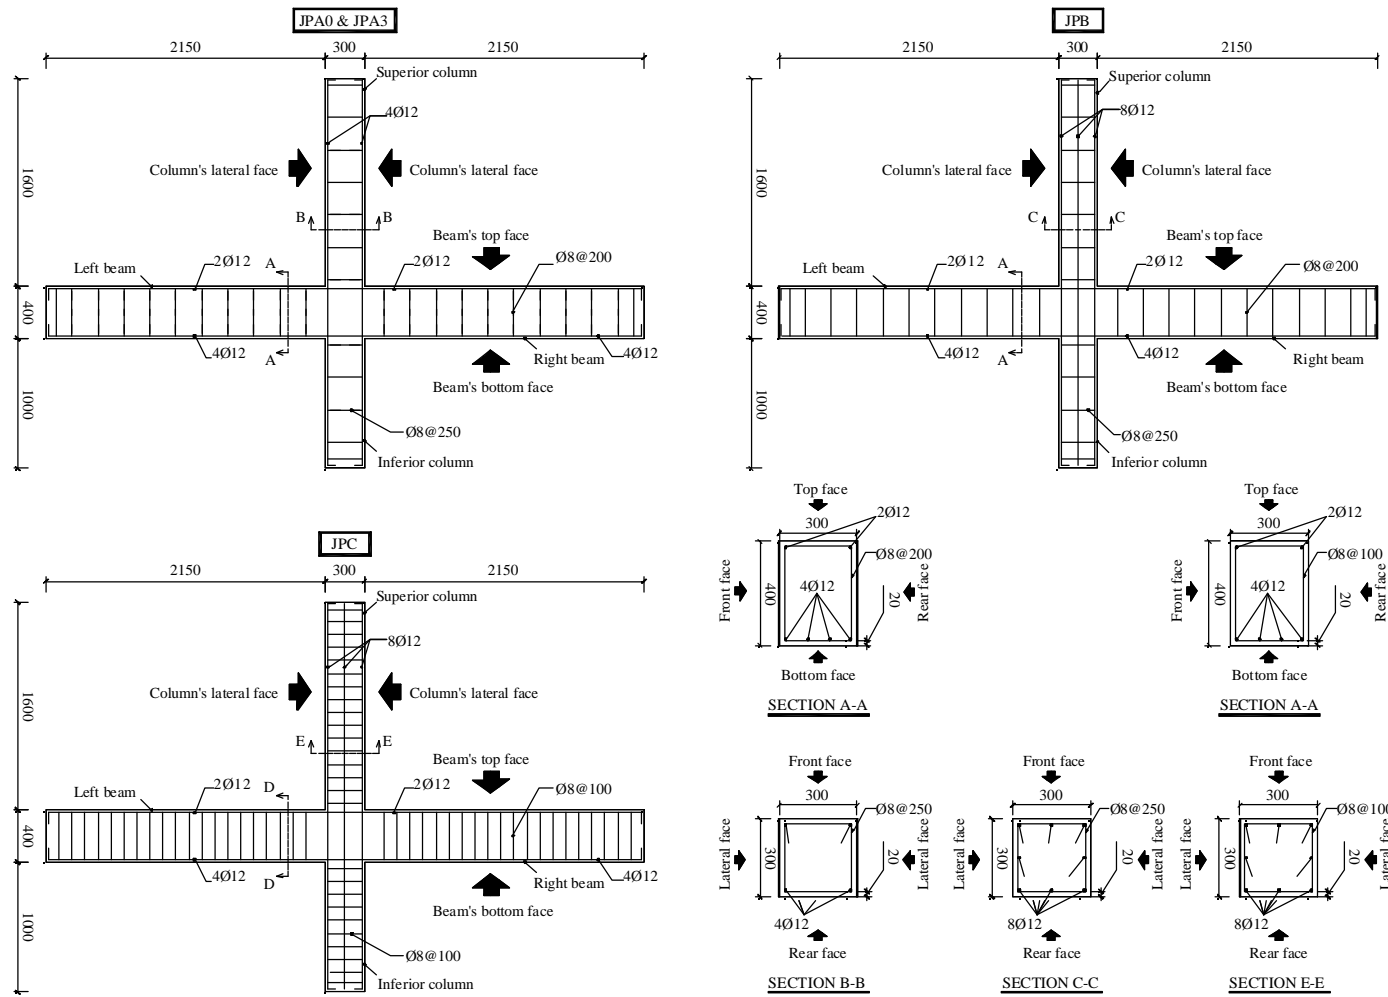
Details of the adopted configurations for the interior beam-column joints.
